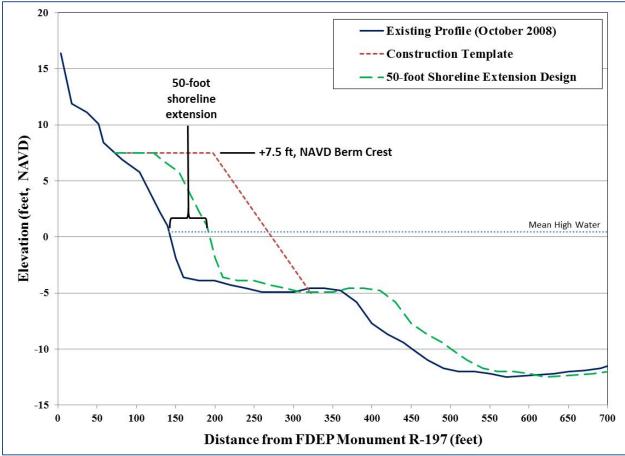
Typical Cross-Section of the Proposed Beach Nourishment Project
